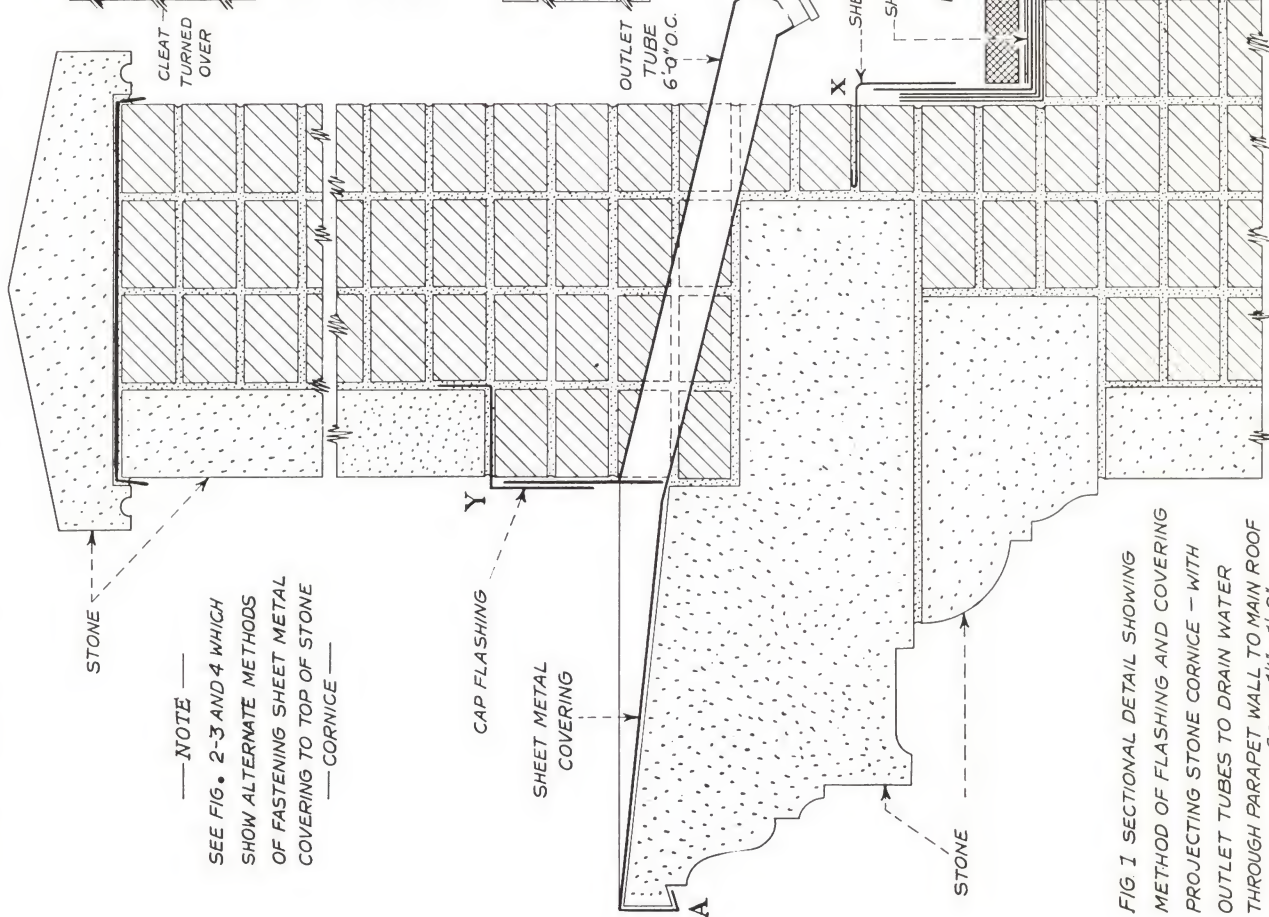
SECTIONAL DETAIL SHOWING METHOD OF FLASHING AND COVERING PROJECTING STONE CORNICE — WITH OUTLET TUBES TO DRAIN WATER THROUGH PARAPET WALL TO MAIN ROOF
